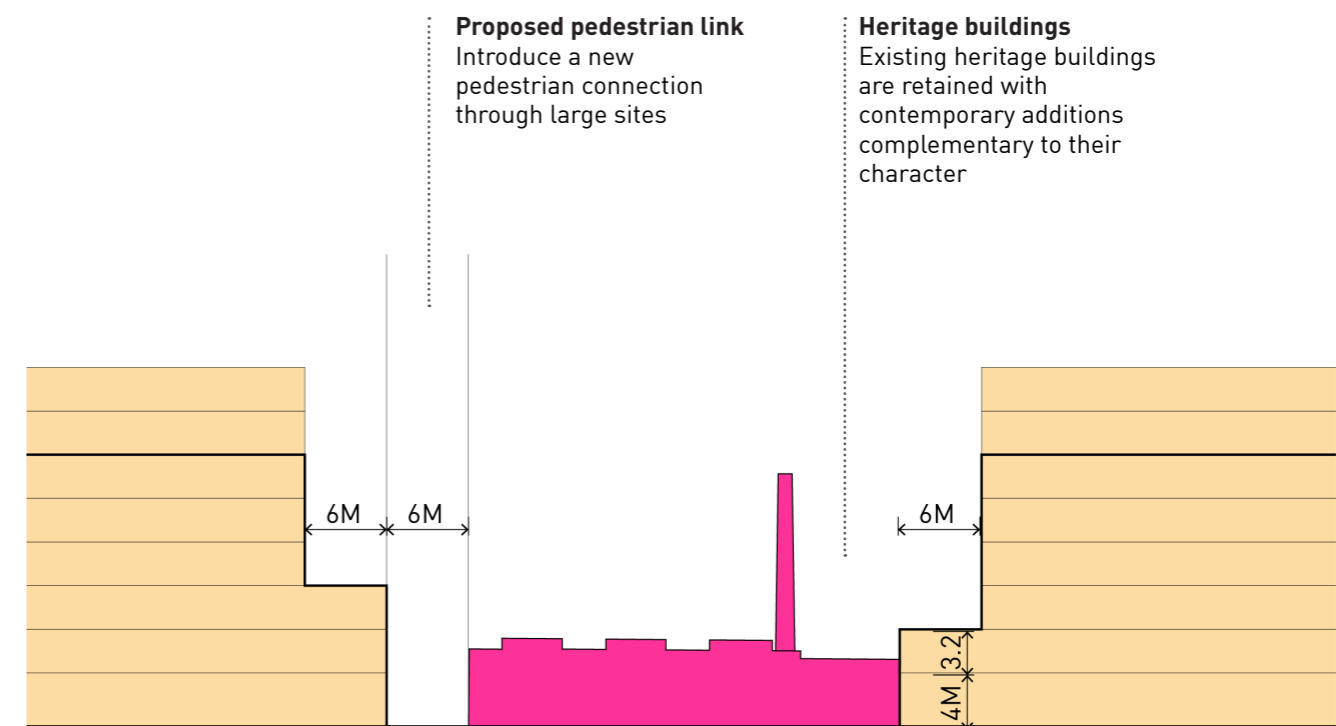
Proposed built form envelopes (elevation) in response to existing heritage building
